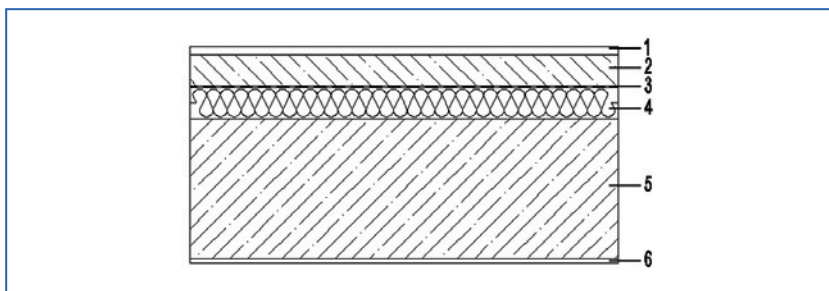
Typical floor structure, 1 – floor covering, 2 – cement/anhydrite screed 40-60 mm, 3 – PE foil, 4 – soft mineral wool board or elastified polystyrene 30-60 mm, 5 – monolithic concrete slab 180-250 mm, 6 - plaster.
